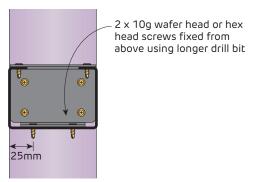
Header to Jamb Stud Connection for Prefabricated Door Frames Section
